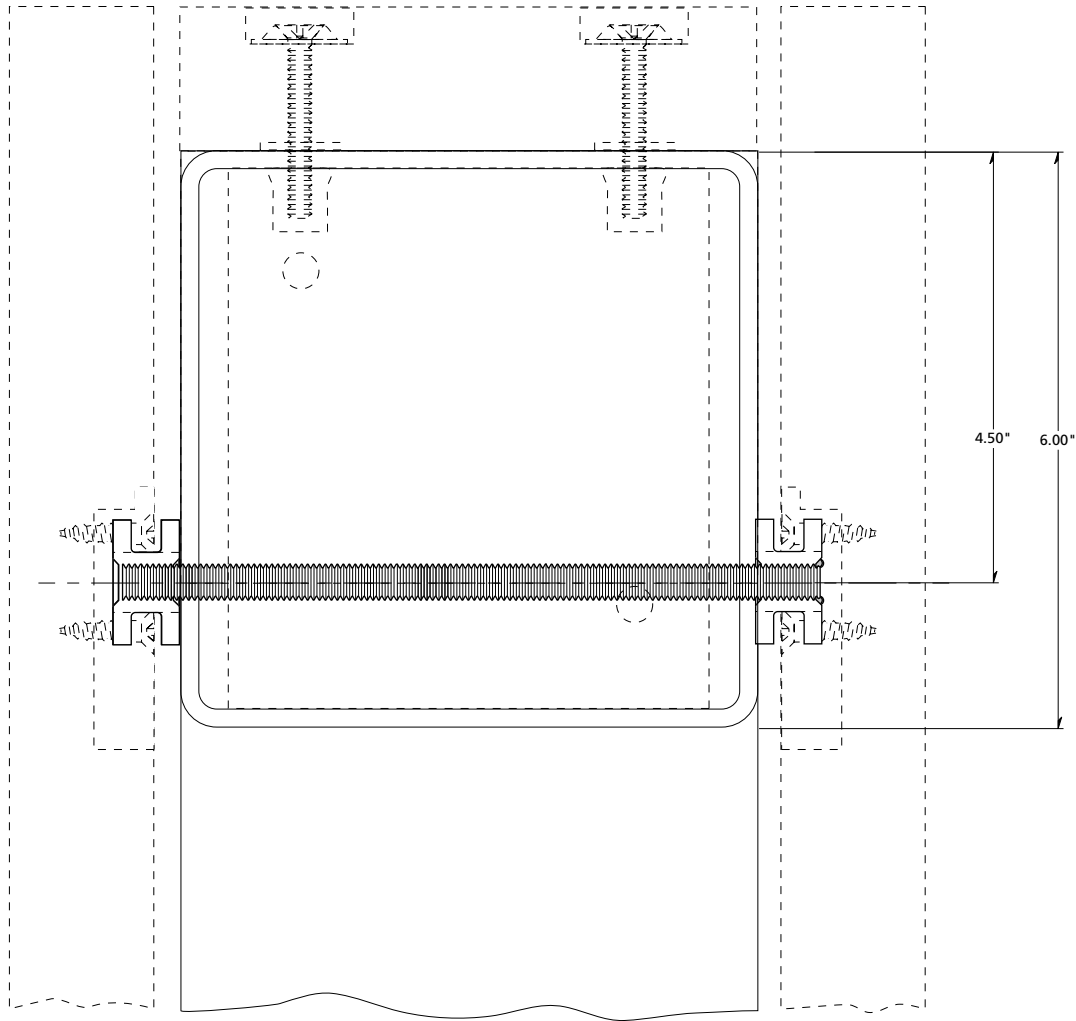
DETAIL POST ASSEMBLY 8 x 6 SIDE ELEVATION
